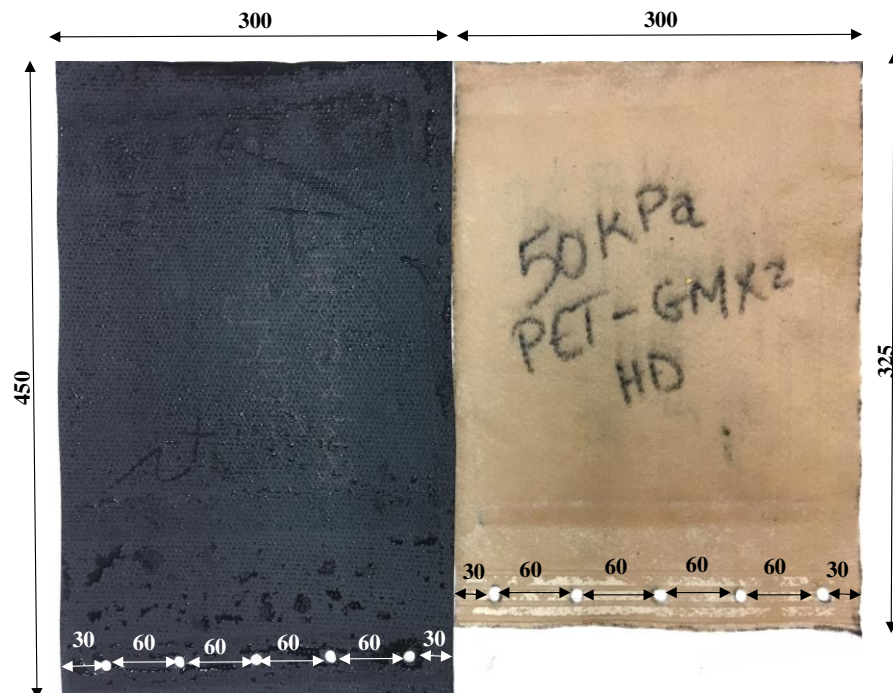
Plan view of the geomembrane and geotextile specimen (all dimension in mm)-
